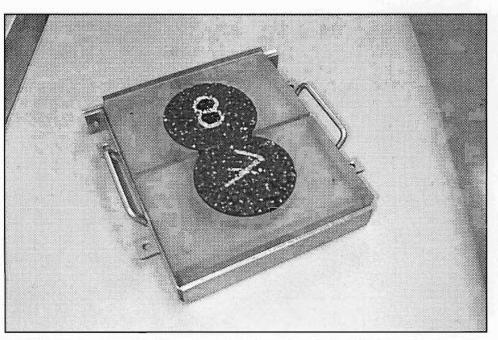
Specimen Configuration for the Hamburg Wheel-Tacking Device with Superpave-Gyratory-Compacted Test Specimens
